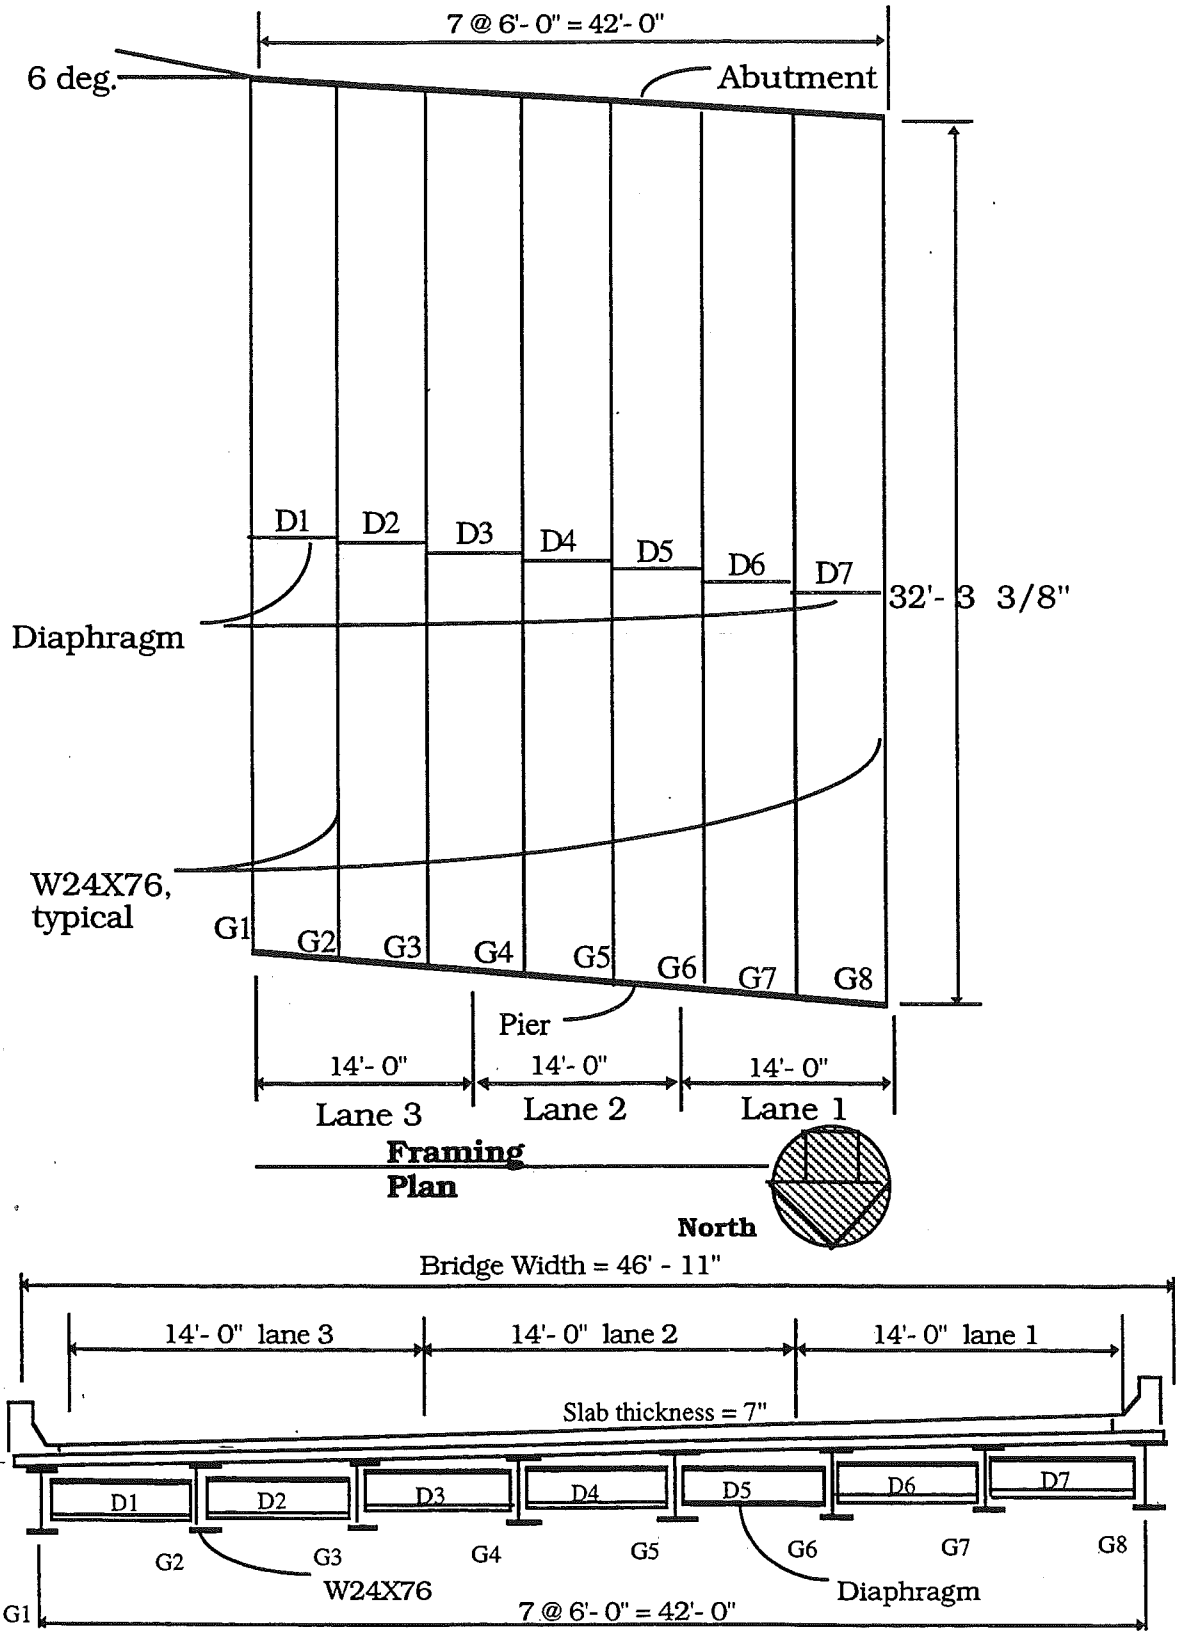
Bridge M39/M10, M-39 Southbound over M-10 Northbound. Plan View and Cross Section of Entrance Span.
